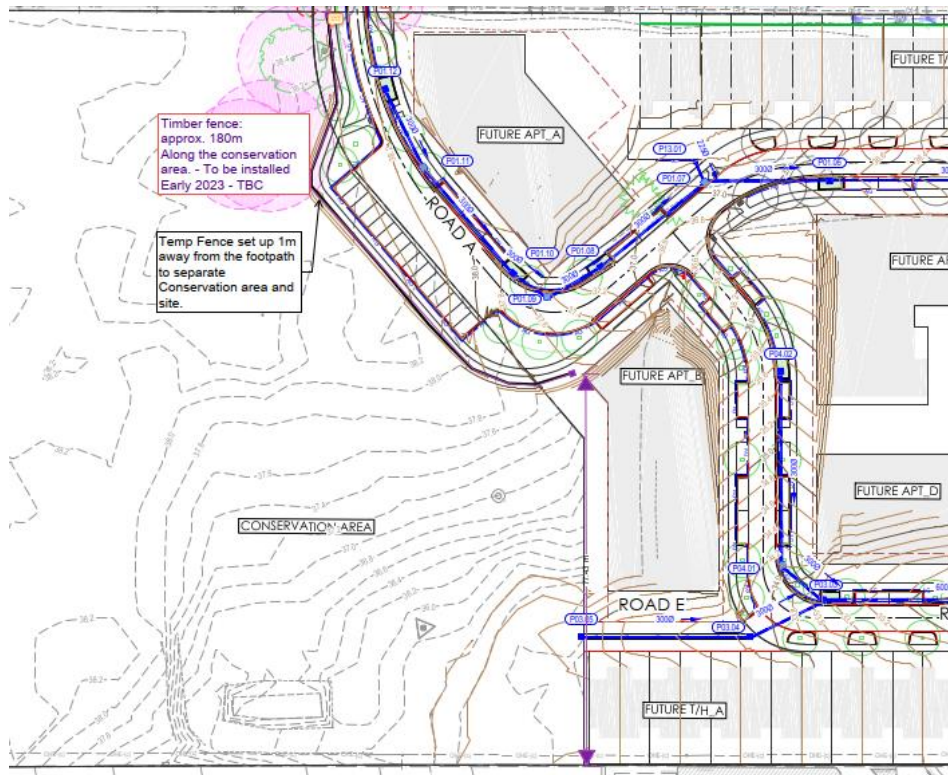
Temp Fence to Separate Conservation Area and Work Zone
